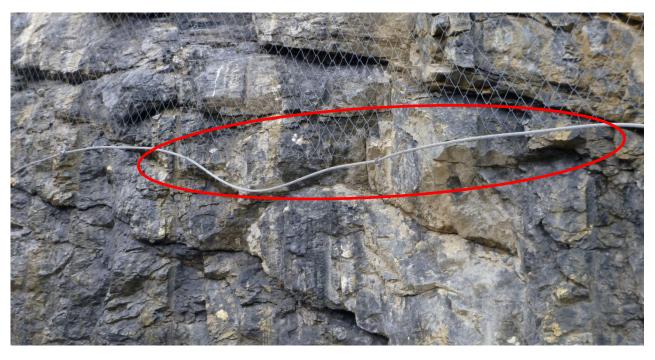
West side of the cutting. Photo was taken facing north on May 7, 2019.
